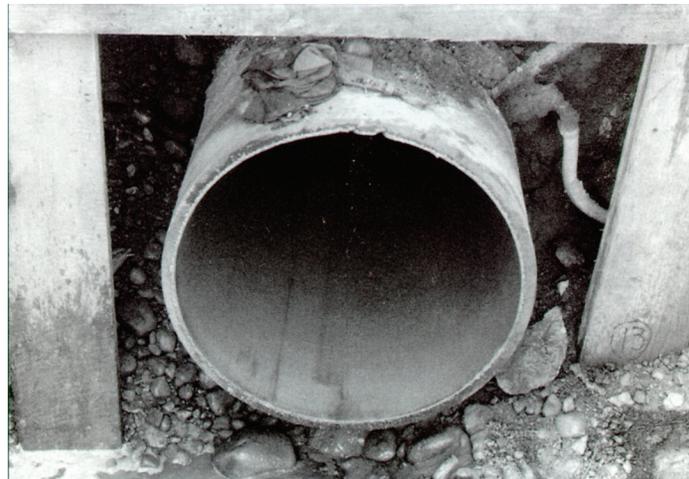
Photo. Completed Installation of Cement-mortar Spray-on Lining.⁽⁸⁾
